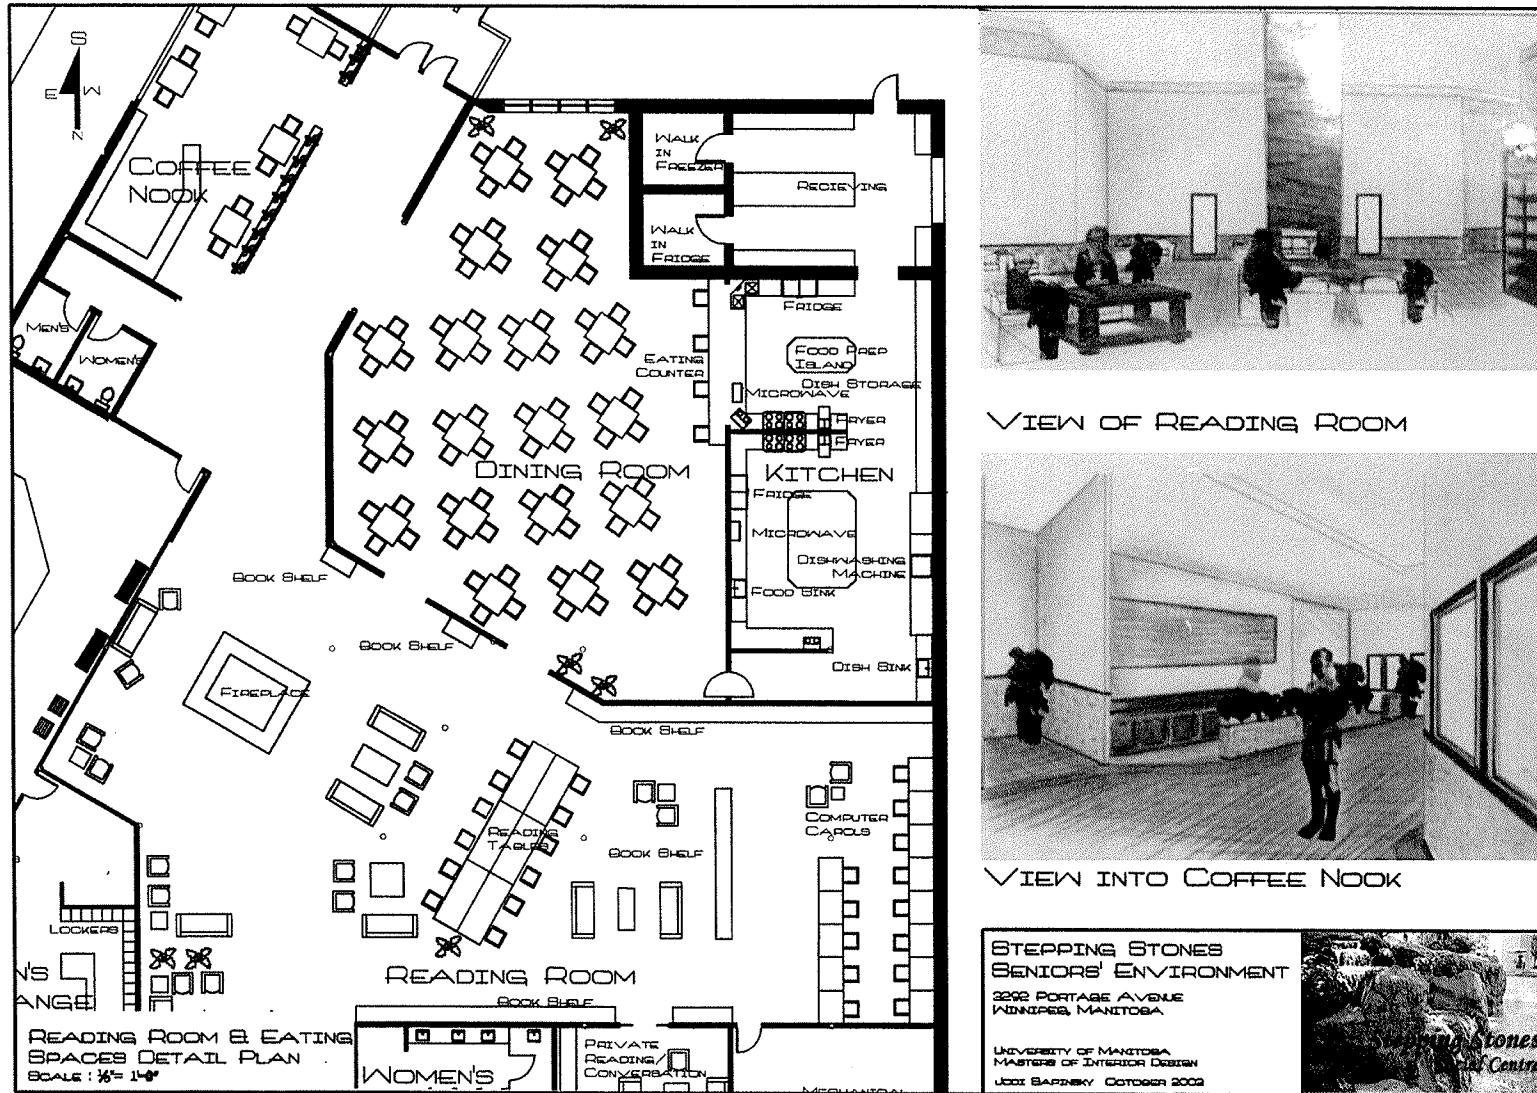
Reading Room & Eating Spaces Detail Plan *Jodi Sapinsky
